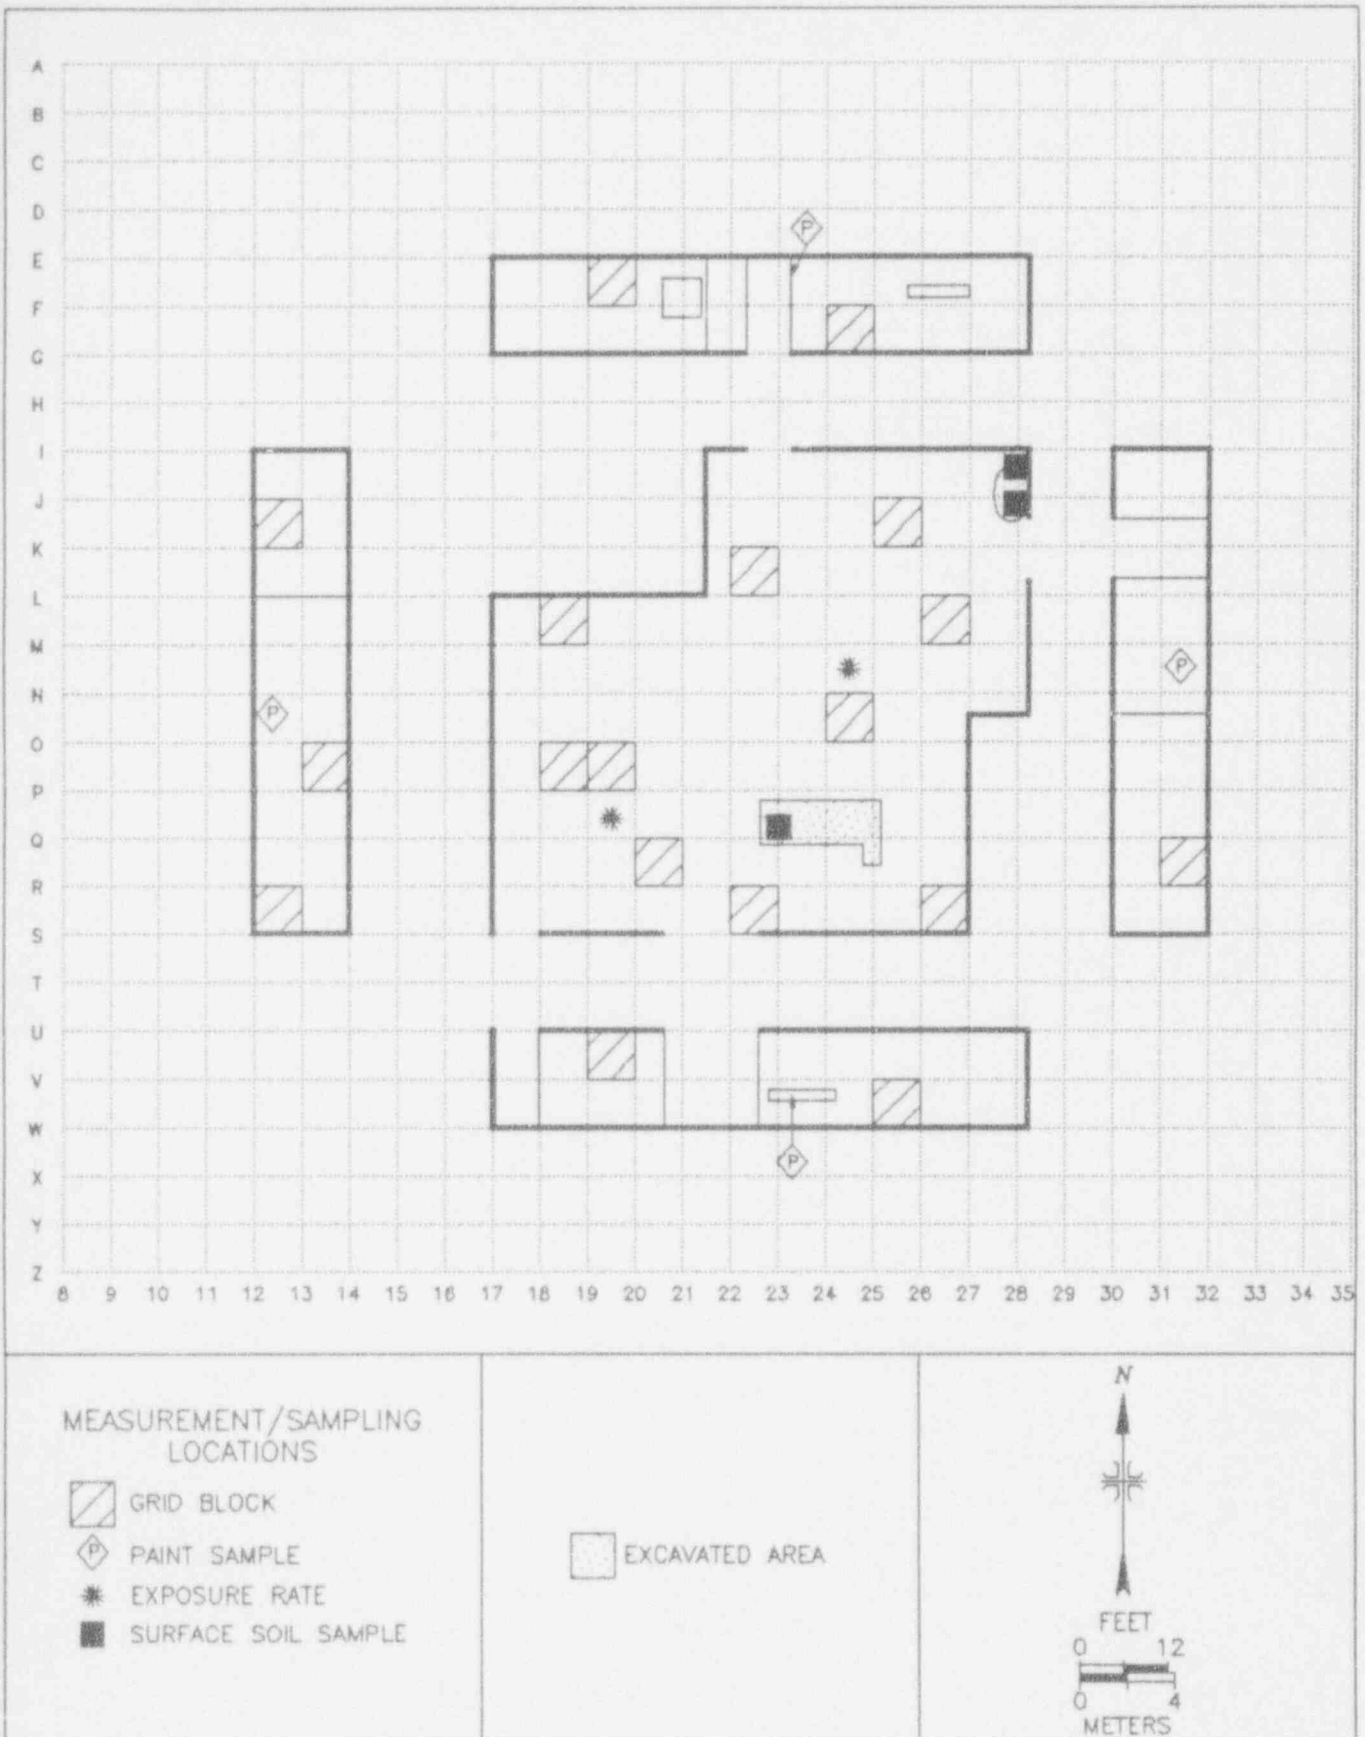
Unit 1 Quality Control (QC) Room, Lower Walls and Floor – Measurement and Sampling Locations
